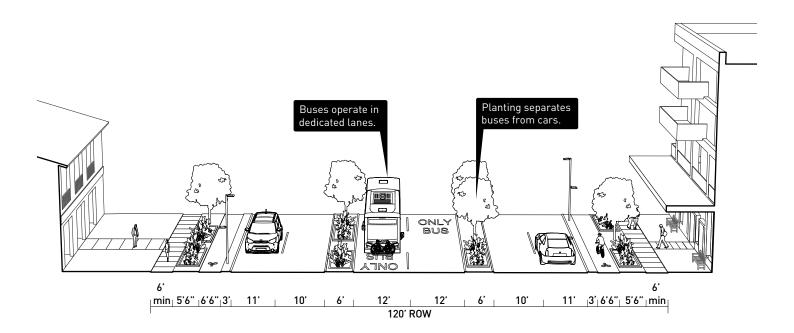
Greens Road Transit Corridor Cross-Sections
